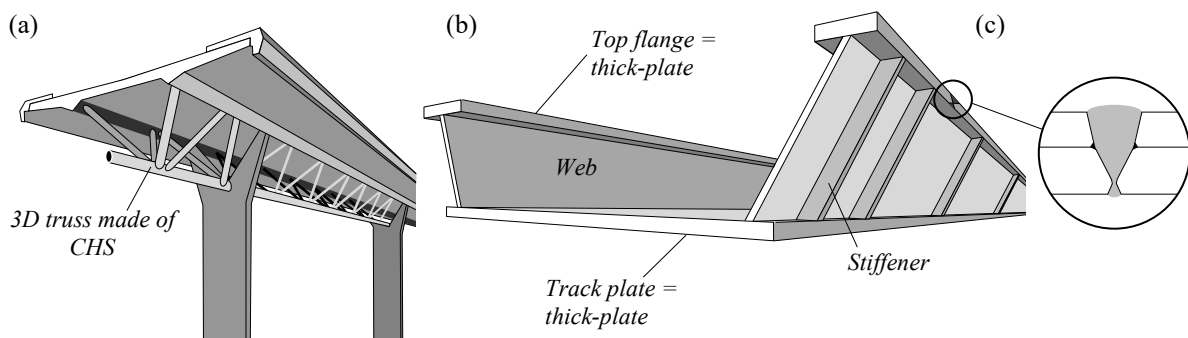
(a) Example of a steel-concrete composite highway bridge, taken from [3], (b) example of a thick-plate trough bridge and (c) an example of a typical lamellae joint.
